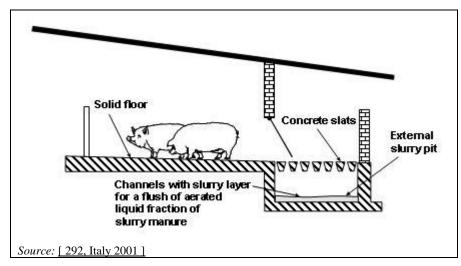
Partly slatted floor and external alley with the flushing of a permanent slurry layer in channels underneath
